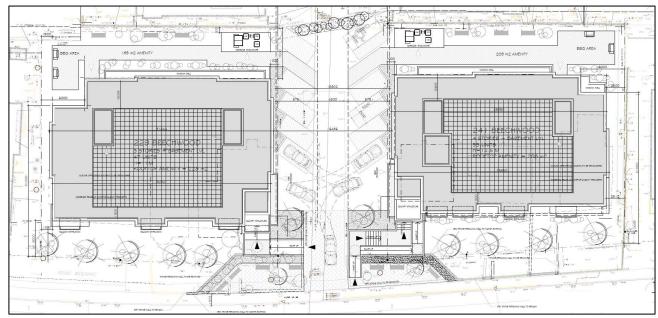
Site Plan, Partial (Woodman Architect & Associates)
